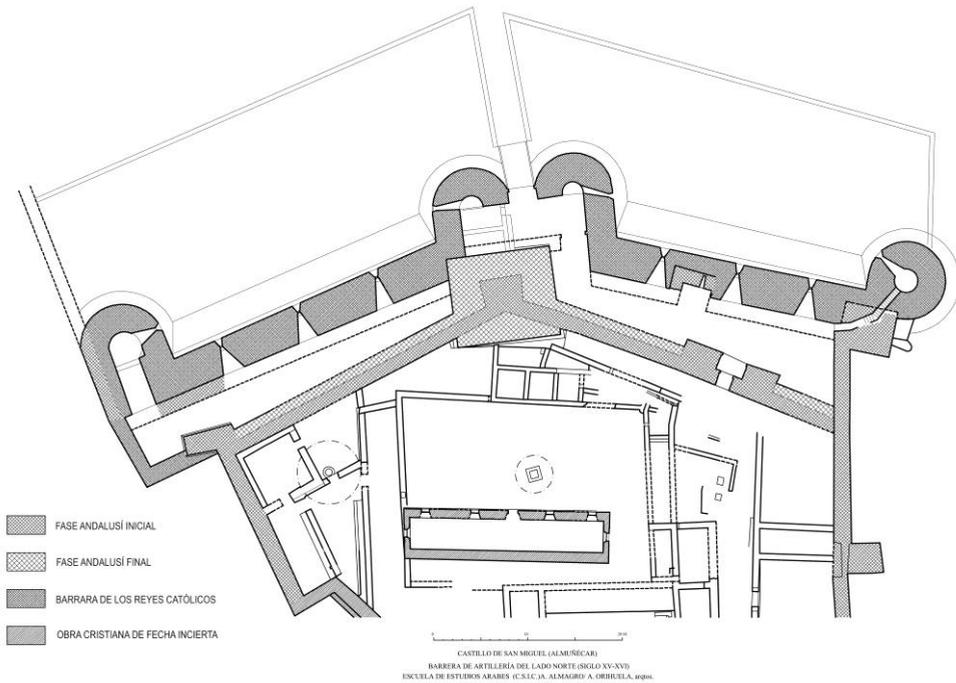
Ground plan of the northern part of the castle of Almuñecar with its artillery barrier
